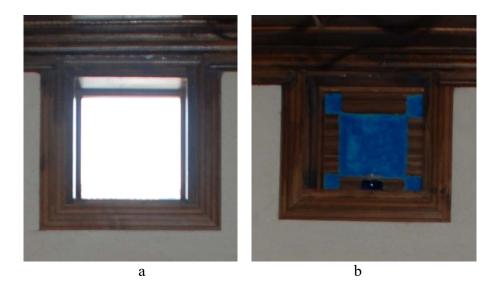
The top window on the east wall (Prepared by Author, 15.10.2018) (a), the top on the south wall (Prepared by Author, 15.10.2018) (b).
